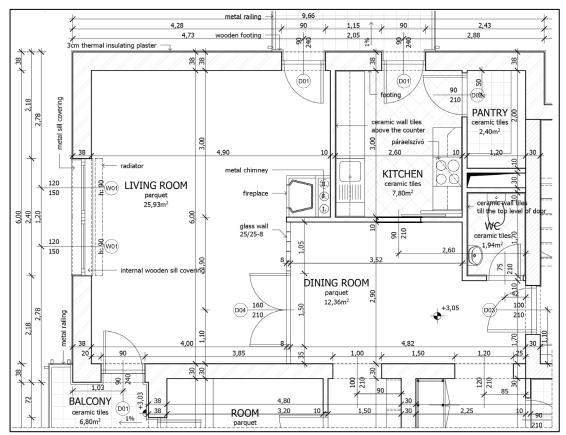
The Example final Floor plan-scale: 1/50 (Budapest University of Technology, 2017).
